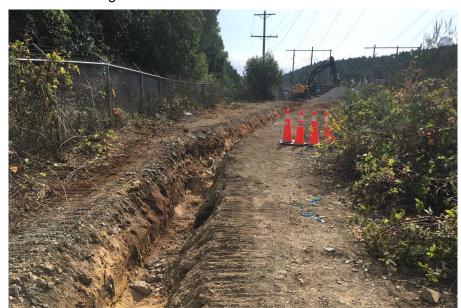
Residual Solids Pump Stations and Bridge Crossings – Excavation of trench to install Hartland water system improvements water main.
